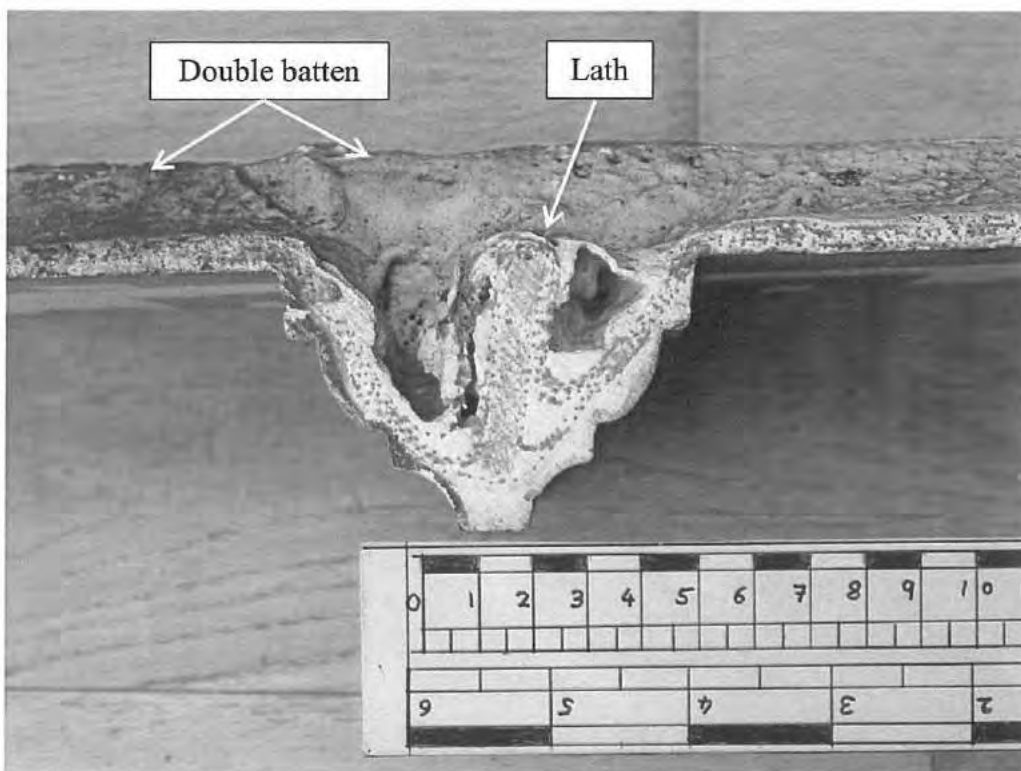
A larger rib from the Palace Theatre panel incorporating a lath on edge taking up the depth of the rib with the horizontal hump along the upper edge covering a double batten
